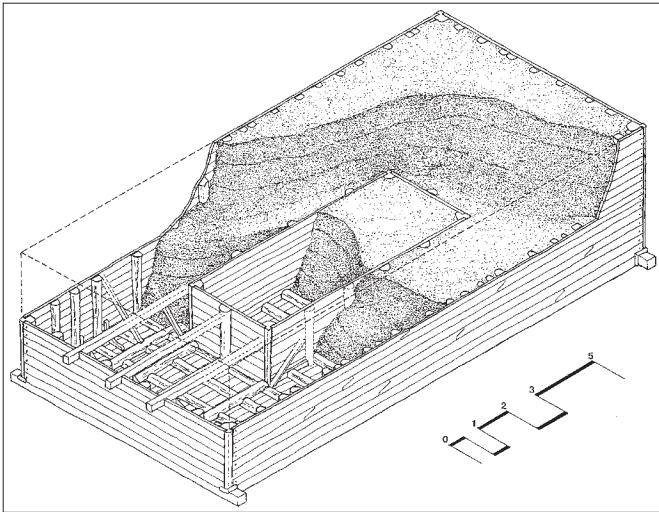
Reconstruction of a prefabricated rectangular caisson as found in Area K at Caesarea (C. J. Brandon).
